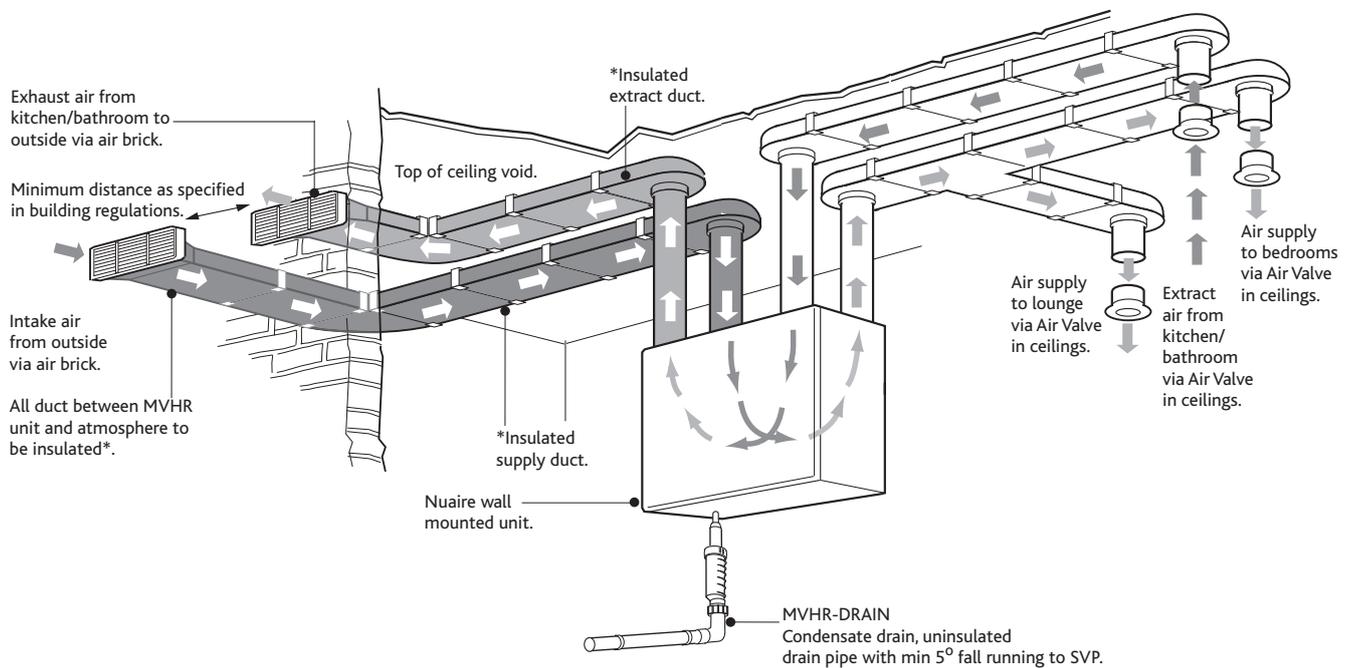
Typical ducted arrangement for a wall mounted unit using rectangular ducting.
